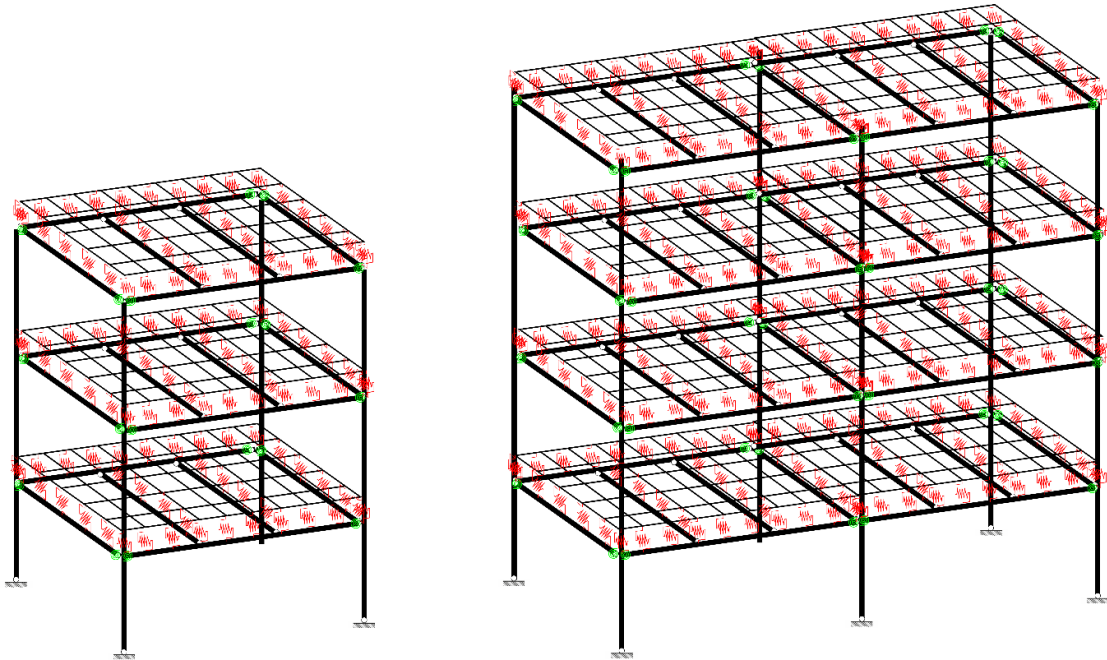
FE-models for a three and four storey steel-concrete composite frame building
